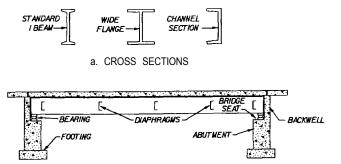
Typical floor systems. (Sheet 3 of 3)
